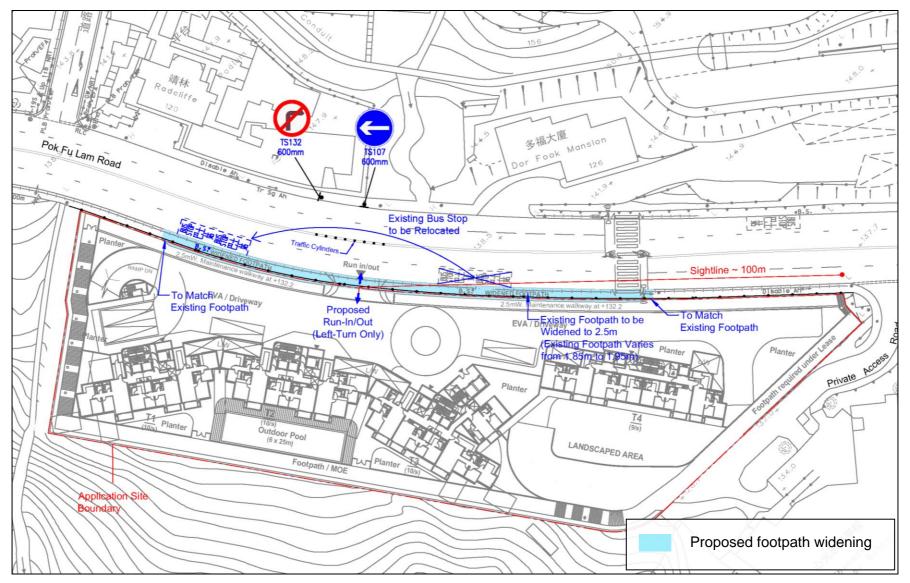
Proposed widening of public footpath on Pok Fu Lam Road to 2.5m
